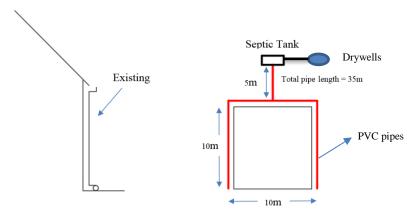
Schematic plan for connecting rooftops runoff to septic tanks.
